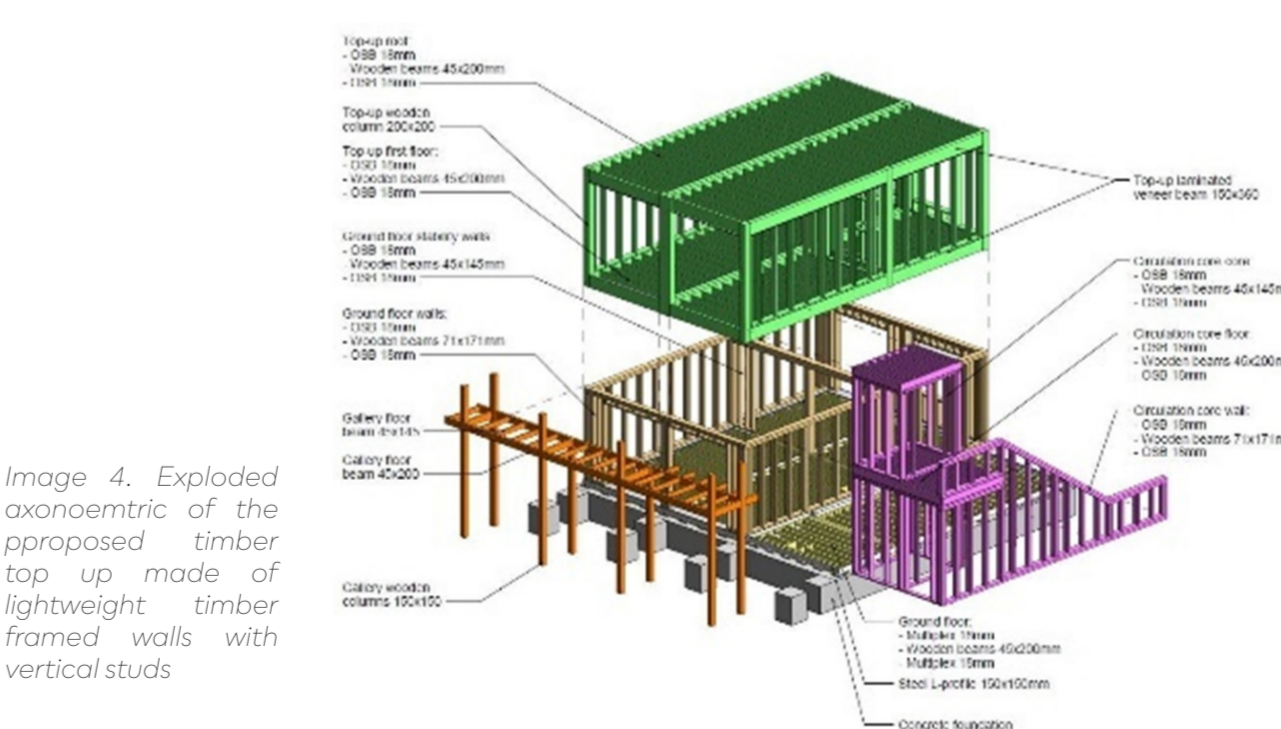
Exploded axonometric of the proposed timber top up made of lightweight timber framed walls with vertical studs
